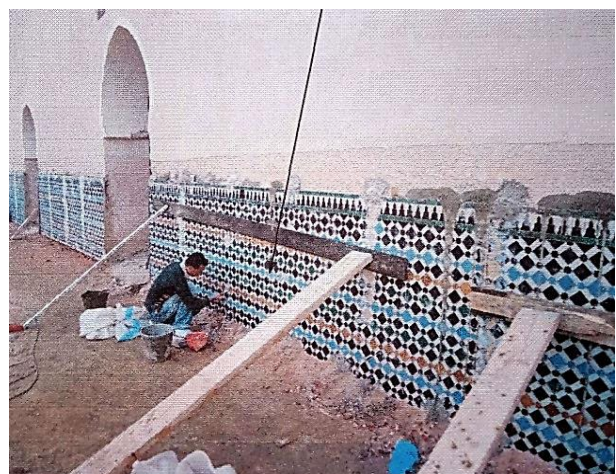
Fixing mosaic pieces on the walls. (Source: Technical Design Office A.R.C.A.D.E. 2011).
